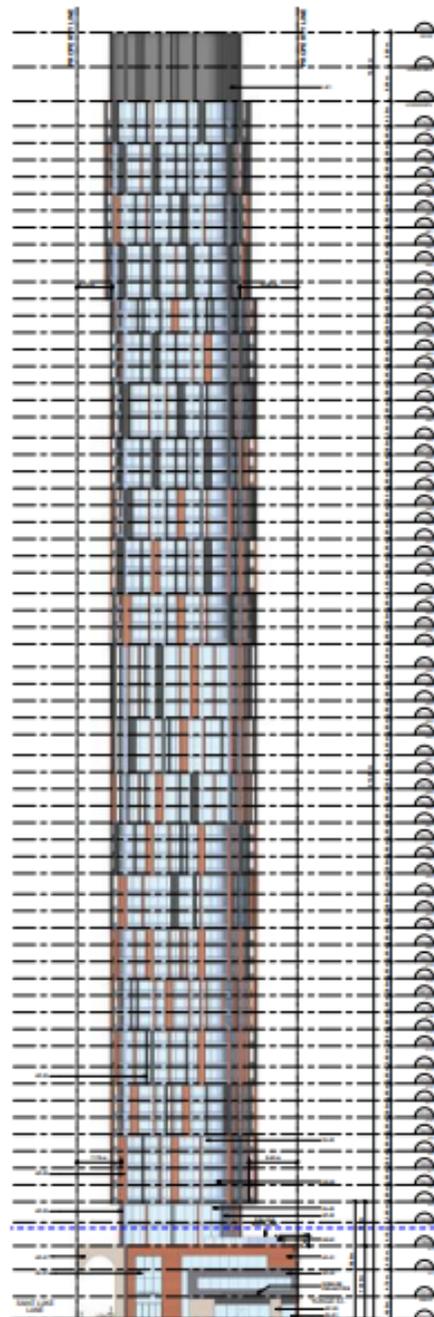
East facade of 530-536 Yonge Street (ERA Architects Inc., 2024).
